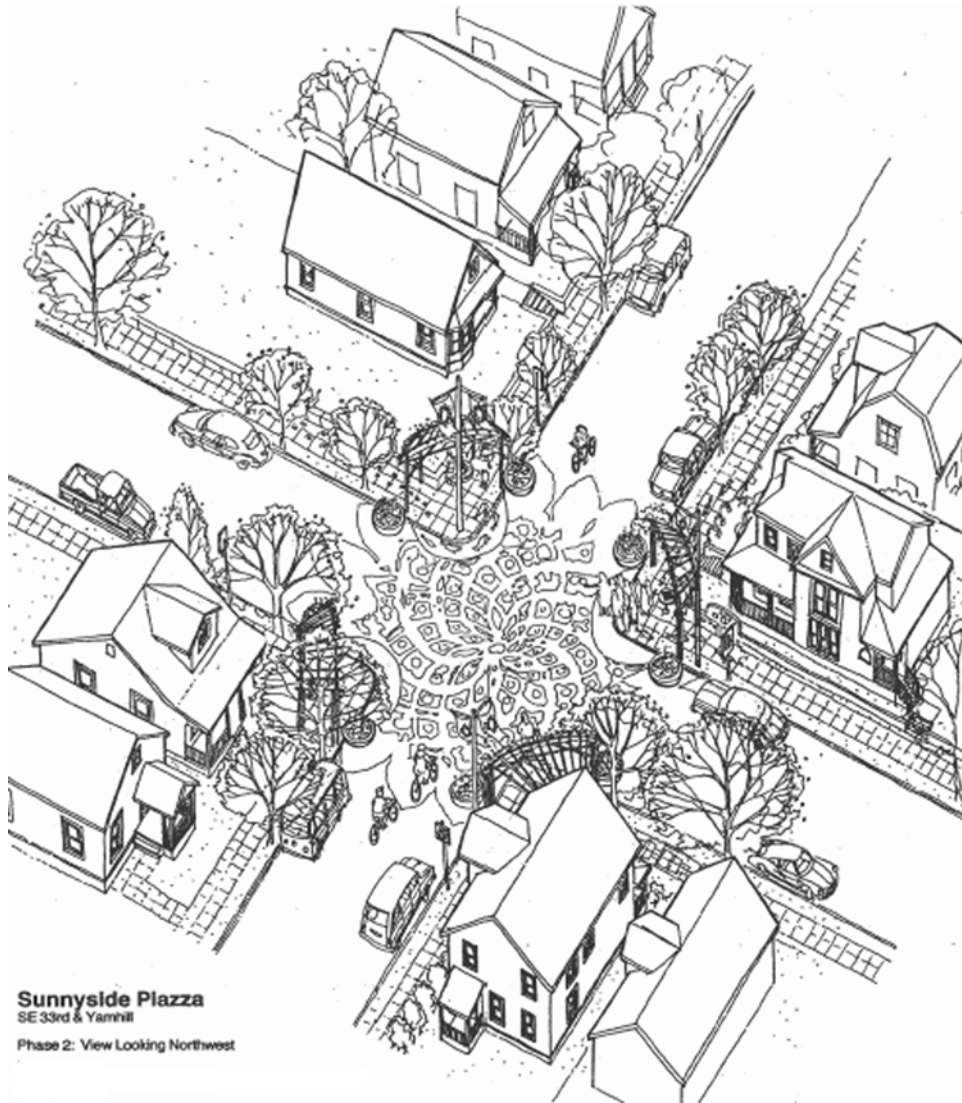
Plan for an Intersection Repair Project, Sunnyside Piazza, Portland, OR. (Source: Reproduced with permission. Semenza, J.C. (2003). The Intersection of Urban Planning, Art, and Public Health: The Sunnyside Piazza. *Am. J. Public Health* 93(9): 1439-1441.)
